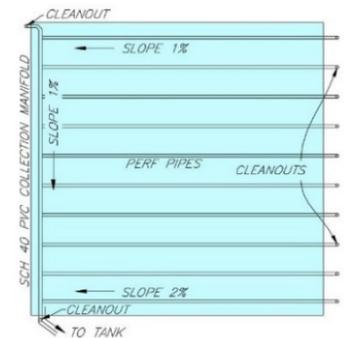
Plan view of the pipe drainage system beneath the wood chip pad.
